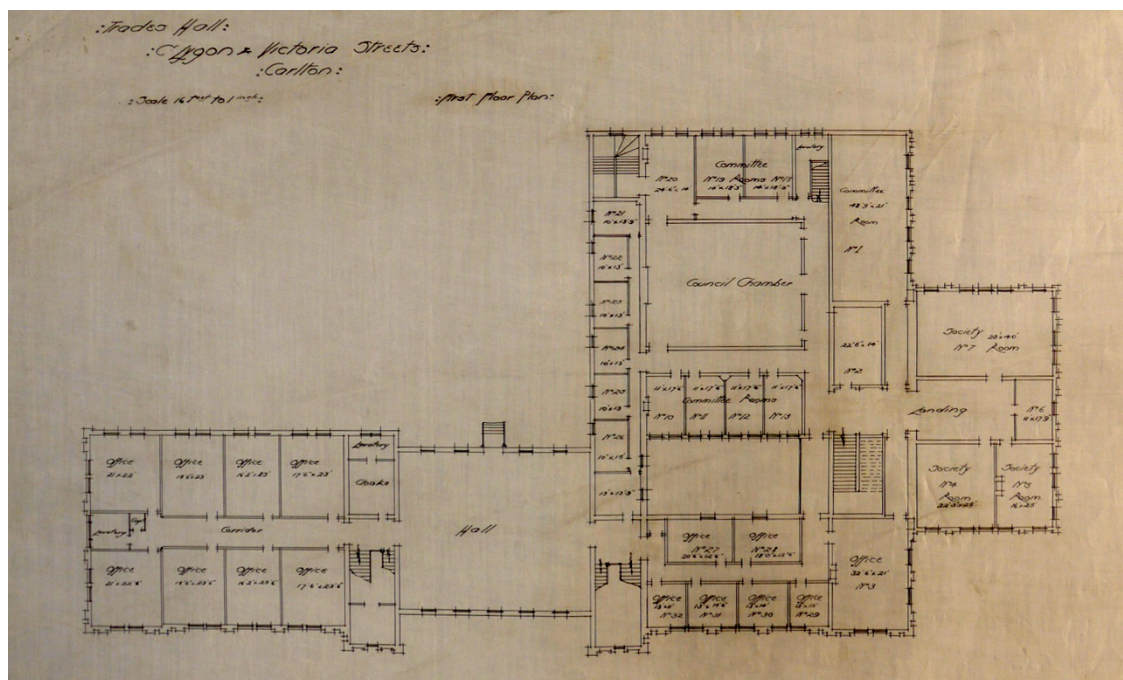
First floor plan of Trades Hall, 1922 (1968.0013, 1922, Job 20)
